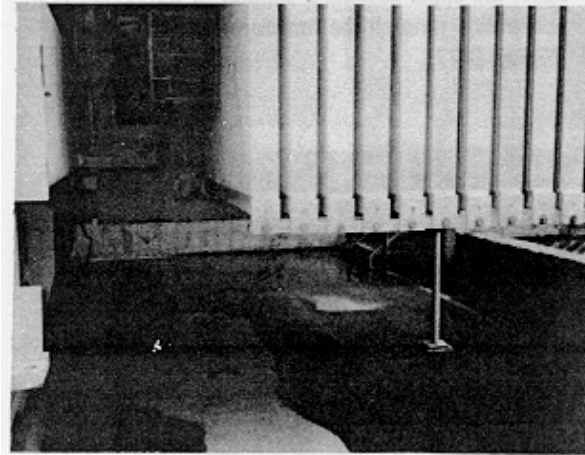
Cooler elements mounted to a manifold. Individual cooler sections are mounted to a manifold which is connected to a flange forming the transformer case penetration. The cooler does have a vertical support and a small diagonal brace. Lateral motion exerts large moments on the flange causing oil leaks. A simple modification is to add angle iron brace between the outside end of the manifold and the corner of the transformer case
